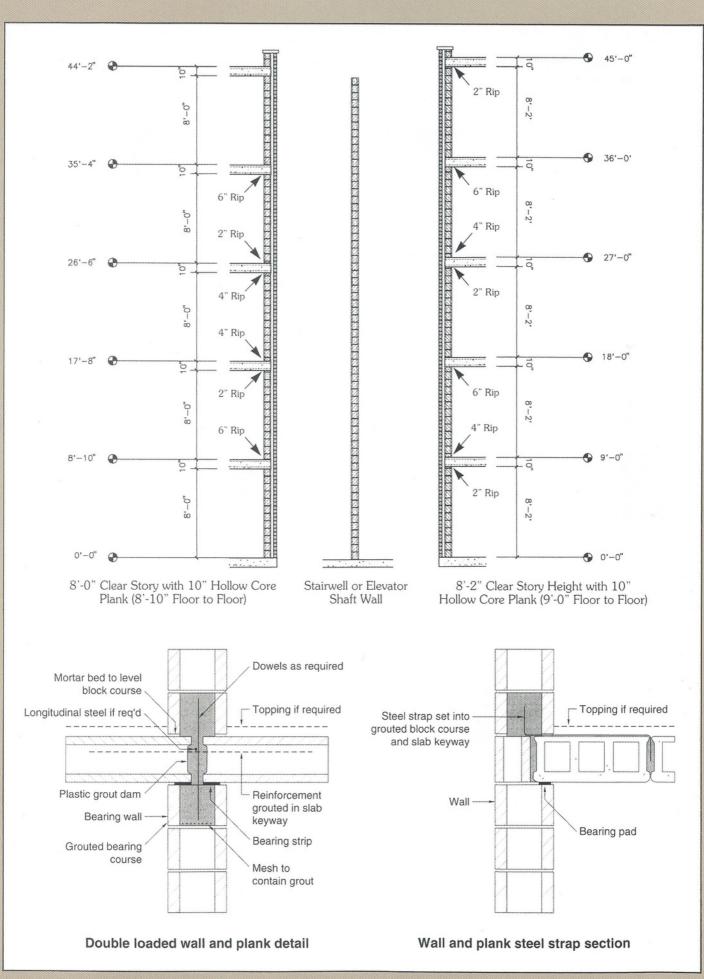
10" Precast Concrete Slab with coursing for 8'-0" height and 8'-2" height
